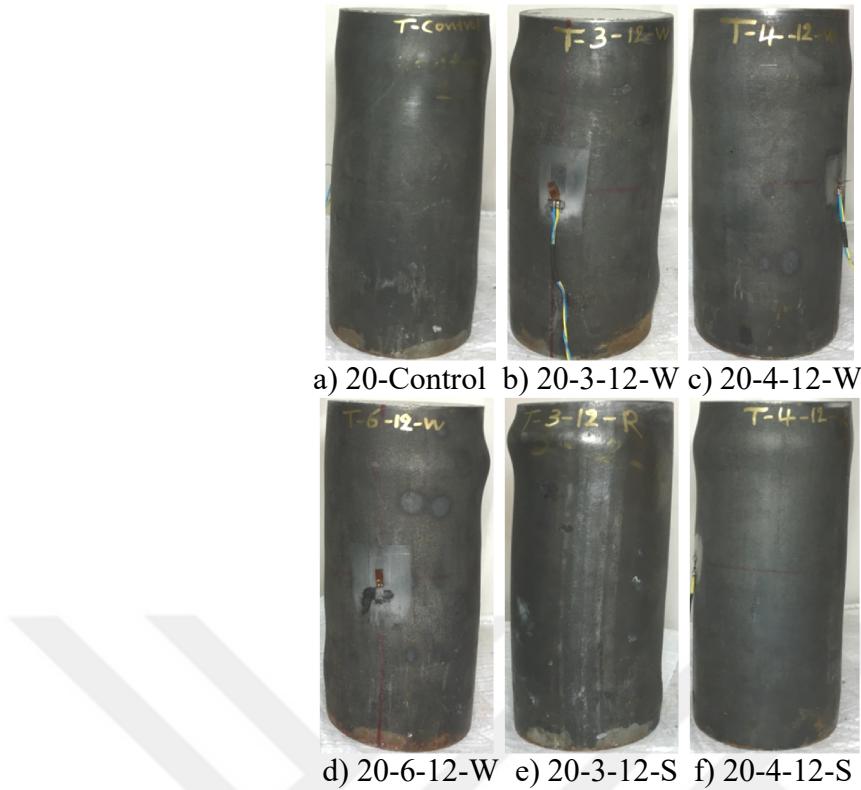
Failure mode of 5.63 thickness steel tubes with $\phi 12$ mm reinforcing bars specimens
